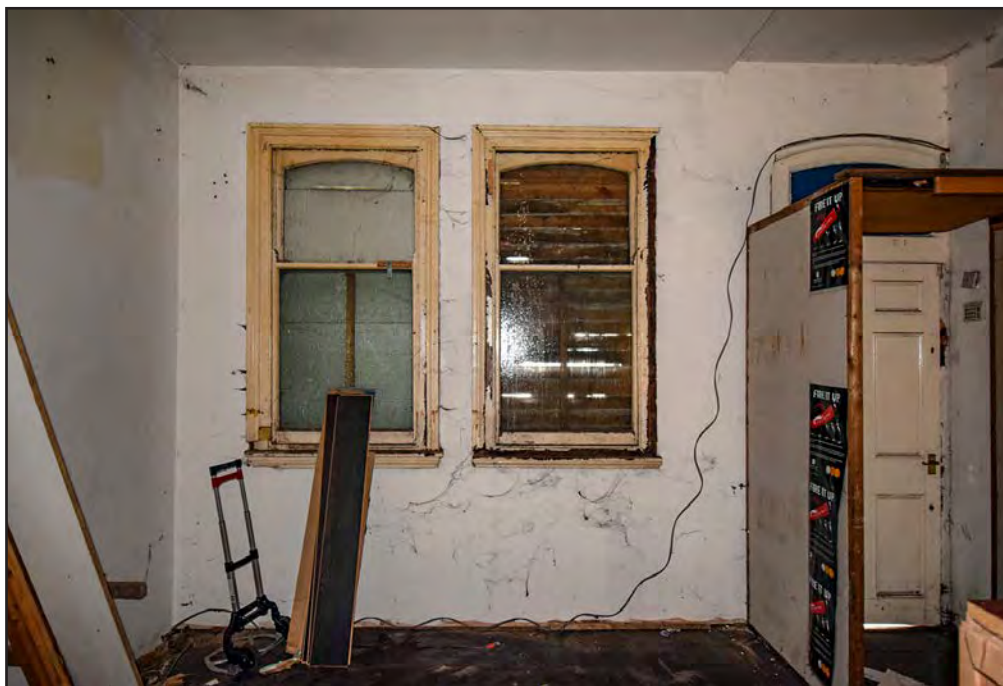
Ground floor windows to Pub Manager’s House to south of entrance
